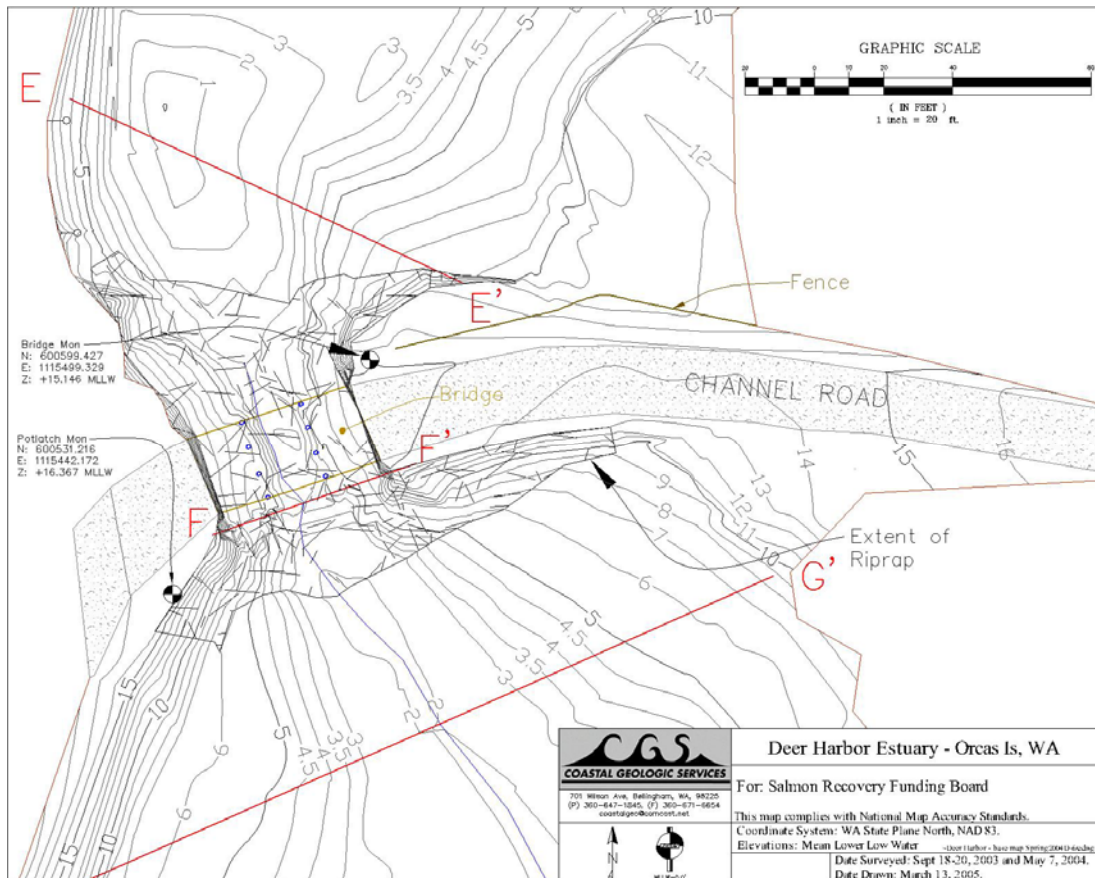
Channel Road Bridge and Cayou Valley Lagoon Outlet Channel
